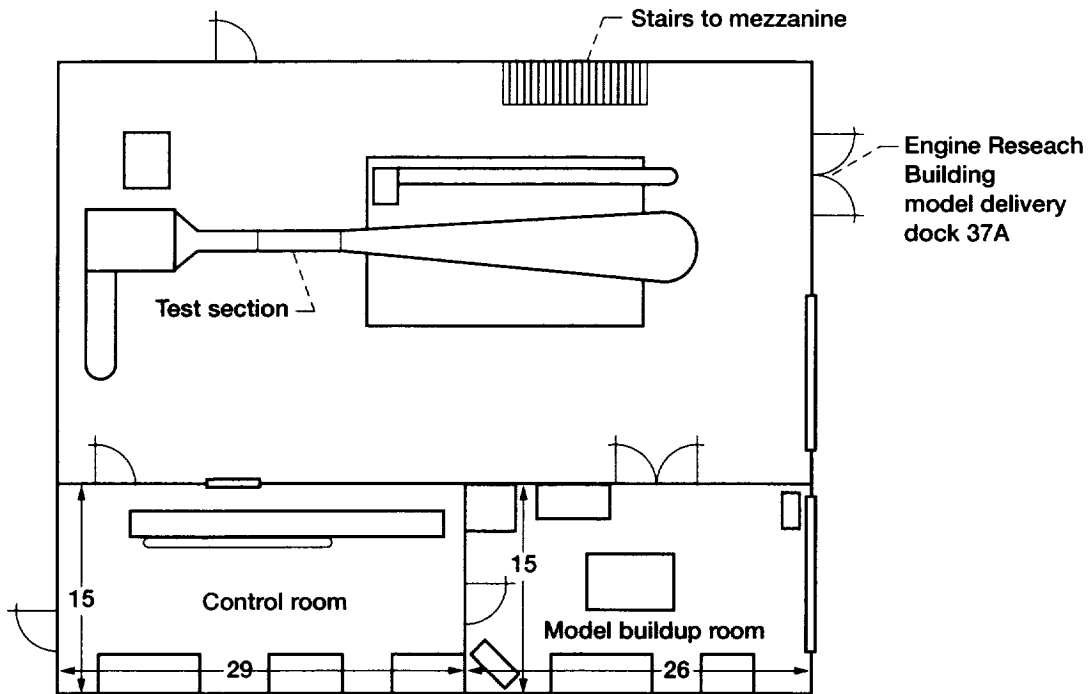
Floor plan for the 1- by 1-foot Supersonic Wind Tunnel Facility, control room, and model preparation area. All dimensions are in feet.
